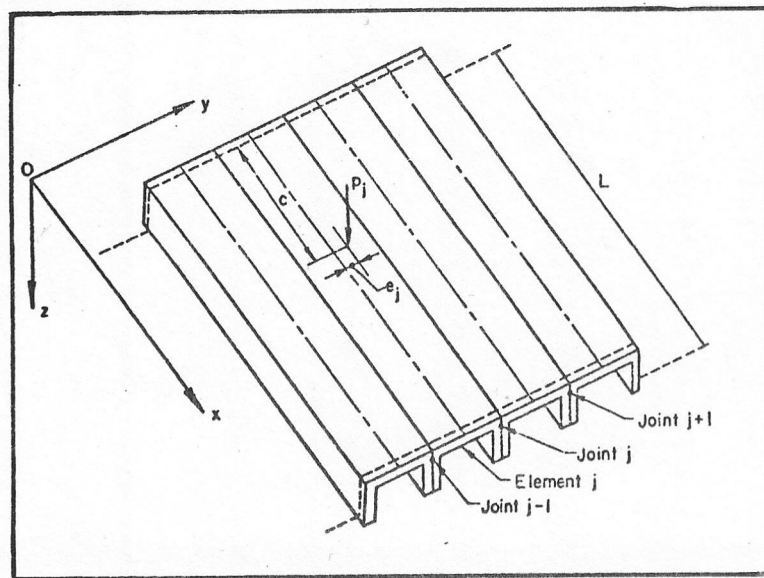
Multibeam bridge with elements of channel section, Khachaturian, ... /47/.
